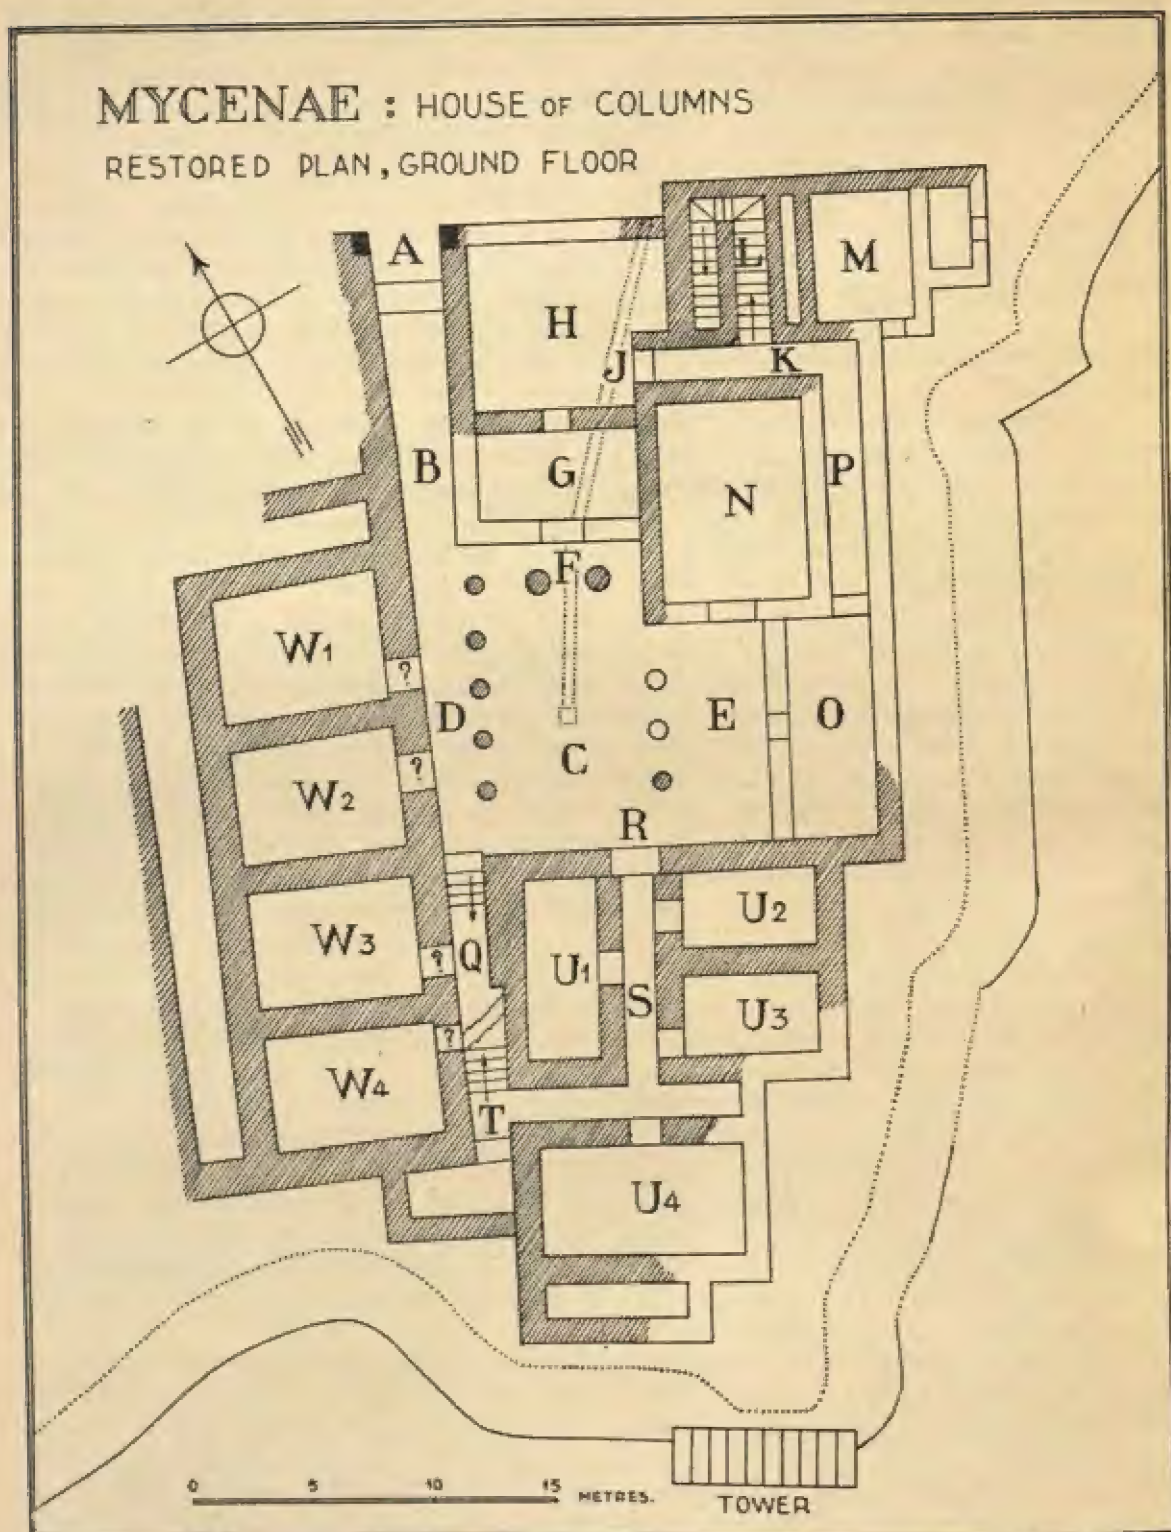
HOUSE OF COLUMNS, MYCENAE, GROUND FLOOR. RESTORED PLAN.
